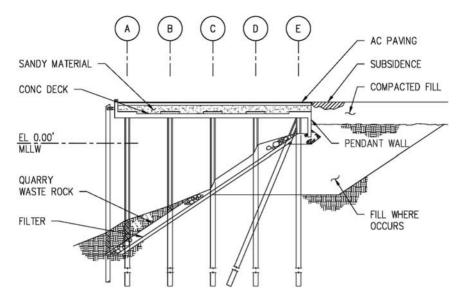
Marginal wharf cross section of pendant wall configuration; movement of the rock revetment slope often leads to exposure of the bottom of the pendant wall, resulting in subsidence of the soil behind the wall
